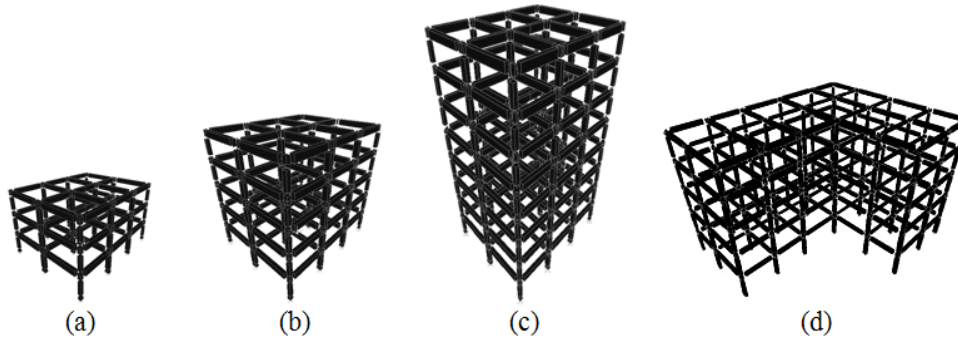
Numerical models regular in plan with 3 floors (a), 5 floors (b), 8 floors (c) and numerical model irregular in plan with 5 floors (d)
